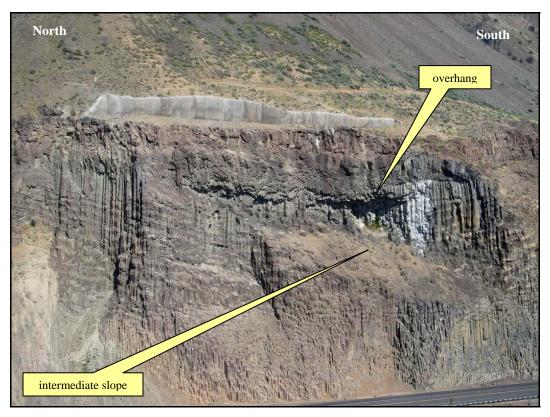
The 300-foot-high basalt slope consists of near vertical, northern and southern sections, a middle section with a prominent intermediate slope and overhang, and a soil nail wall beyond the slope crest.
